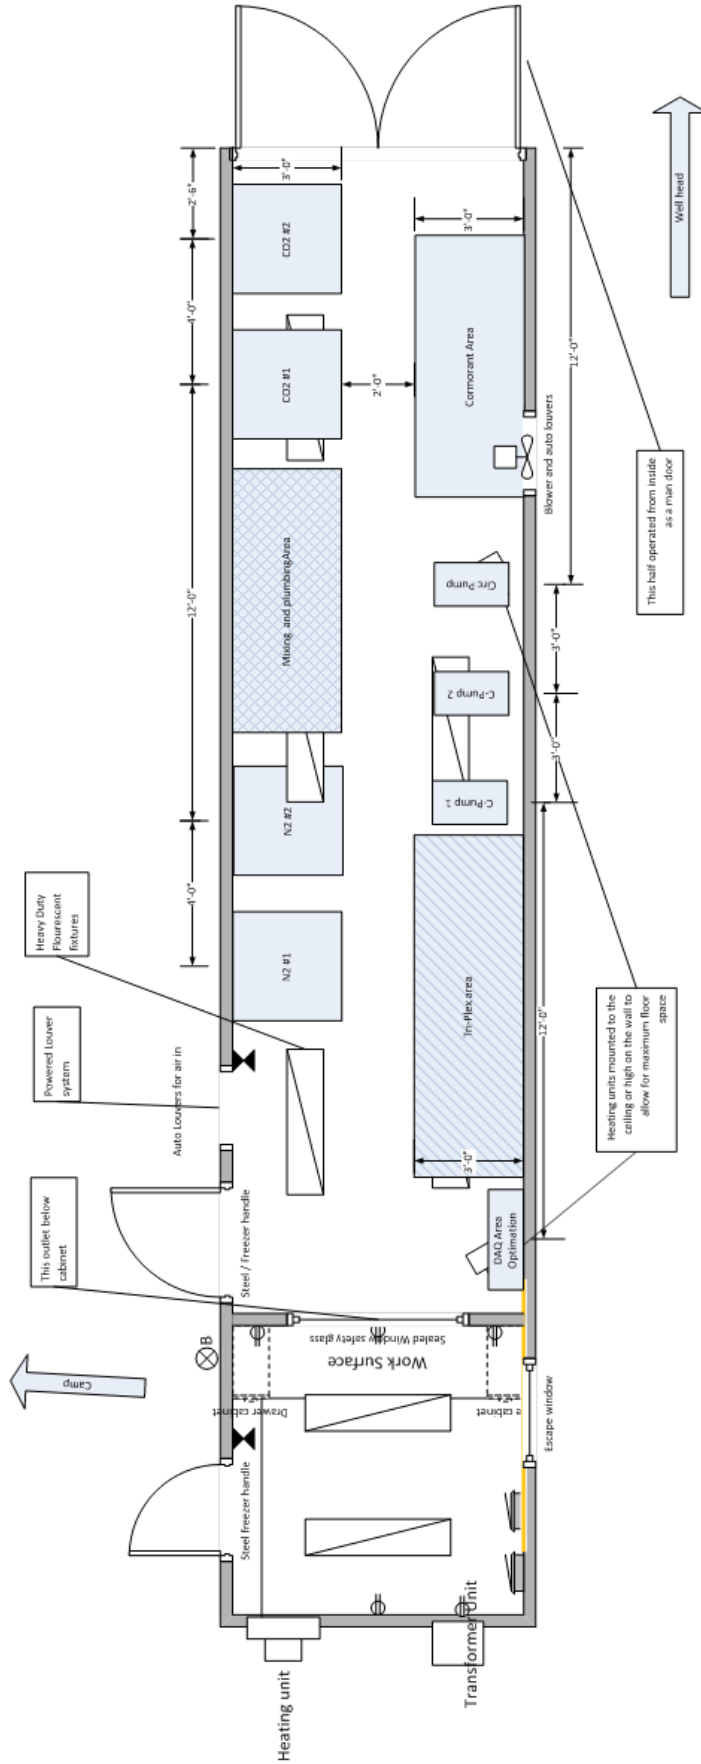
Schlumberger Gas Mixing Skid Floor Plan
